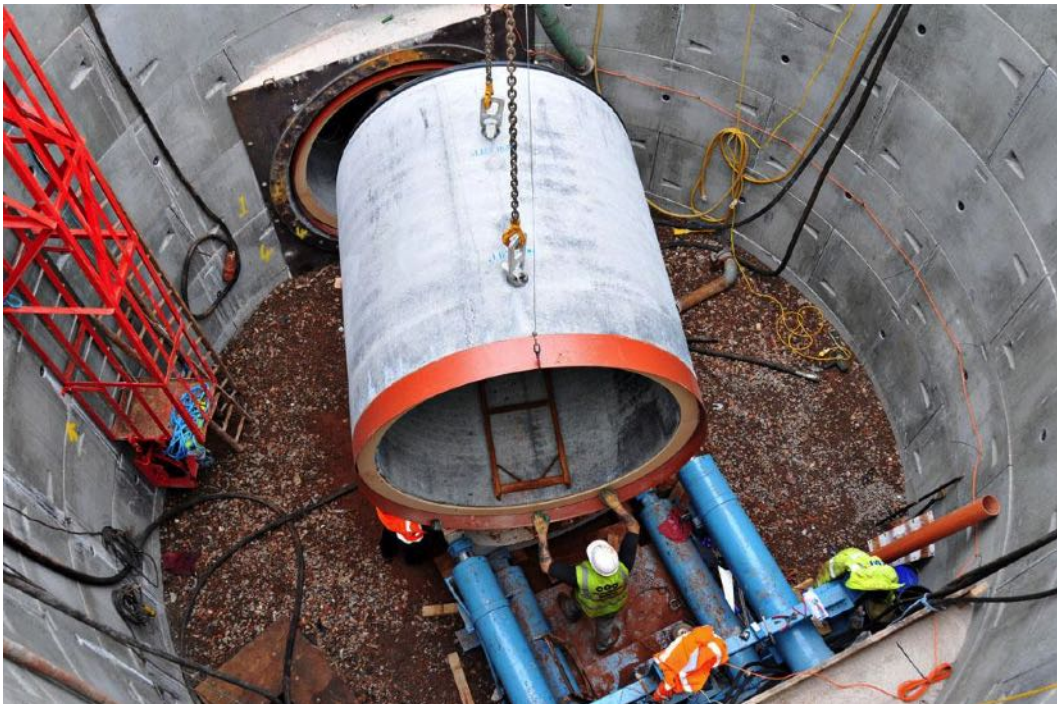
Typical setup of the jacking frame installing the pipeline in a tunnel shaft
